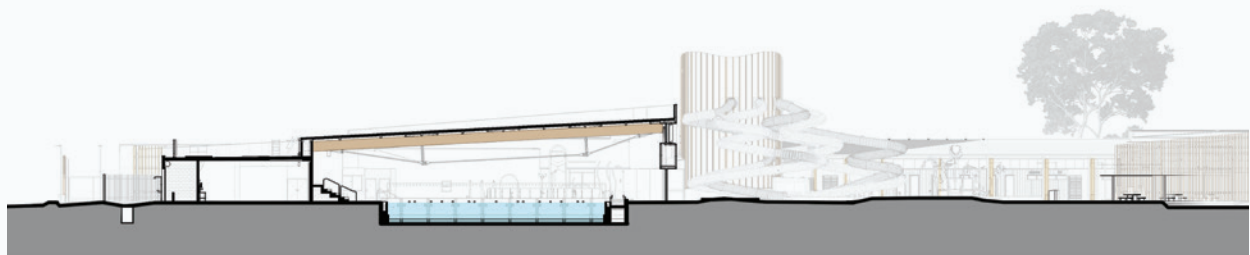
Pool hall section illustrates large bow string trusses and north facing fenestration facilitating daylighting and connectivity to outdoor courtyard – see also Figure 9. (Drawing: NBRS + Donovan Payne Architects)
